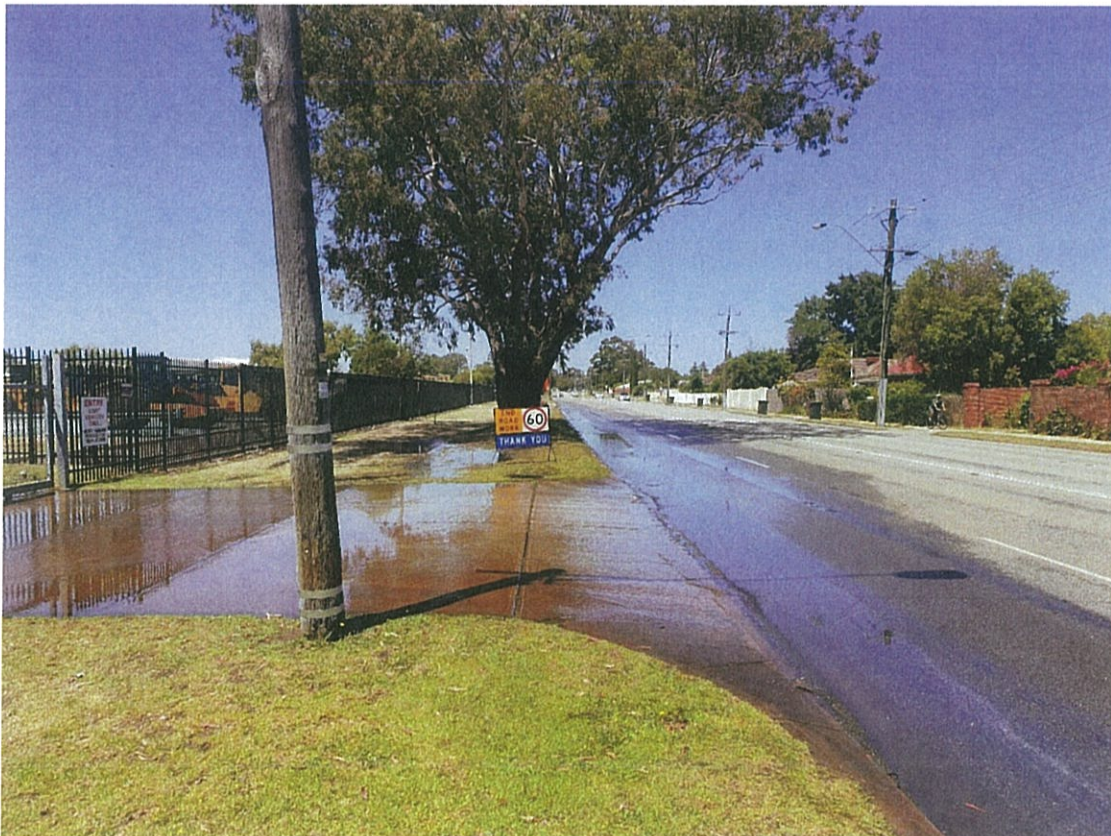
Wastewater flooding on Great Eastern Highway, South Guildford.
